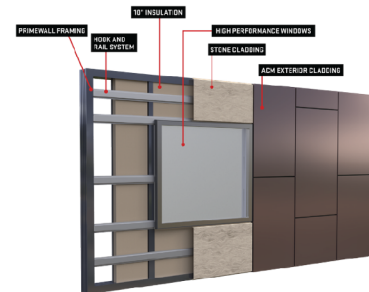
• PRIMEWALL UNITIZED ASSEMBLY FRAMING • HOOK & RAIL • INSULATION • GLAZING • CLADDING
